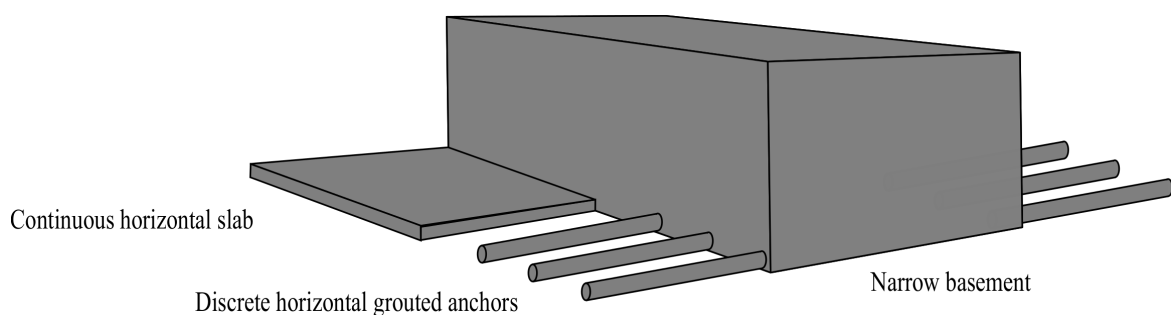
Horizontal extrusions: a continuous horizontal slab or discrete horizontal grouted anchors.
